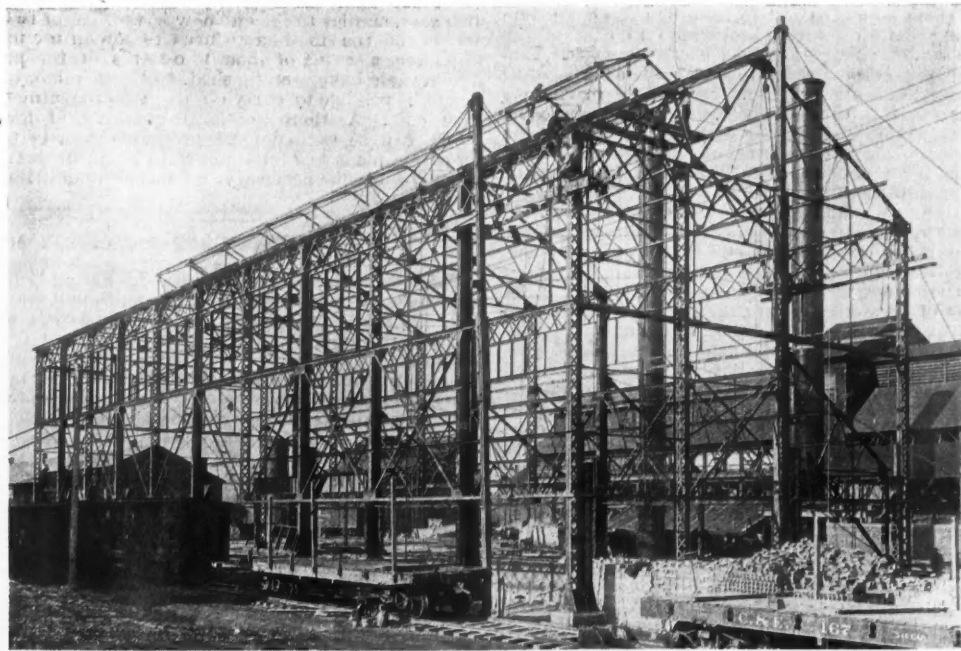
PIT FURNACE BUILDING, OHIO STEEL COMPANY.
